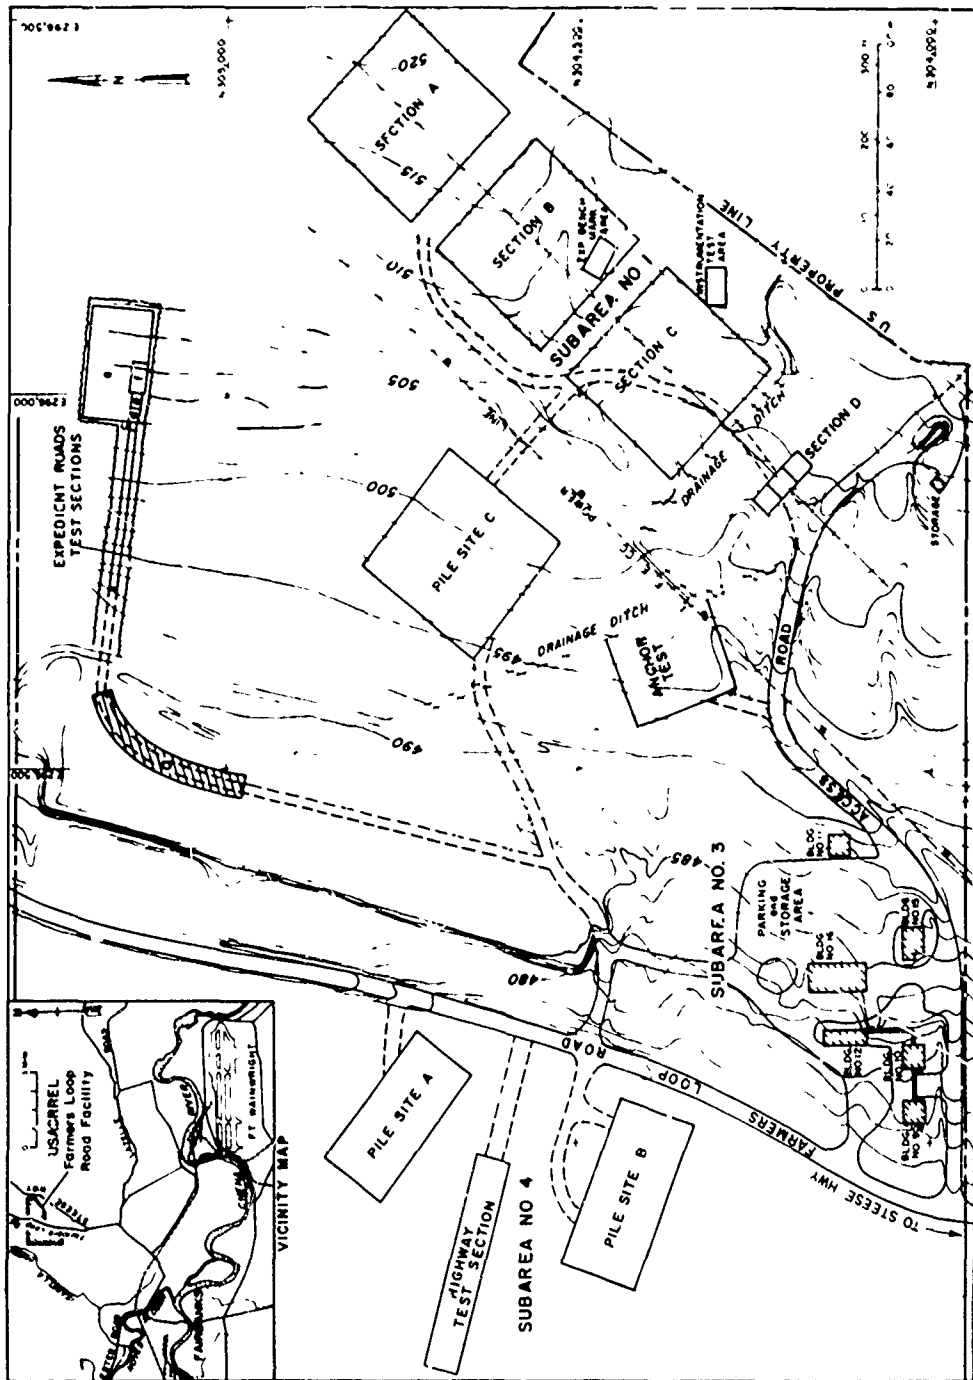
General plan of the USA CRREL Farmers Loop Road facility (MESL road section marked "a" and shaded).
